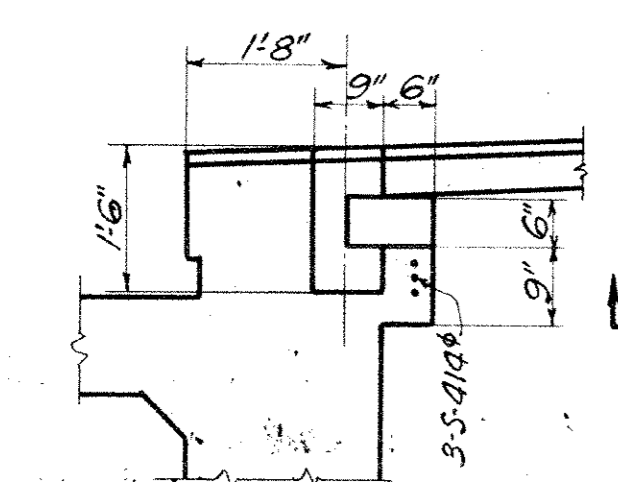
DETAIL SHOWING MANHOLE FRAMES Scale: 1/2"=1'-0"
